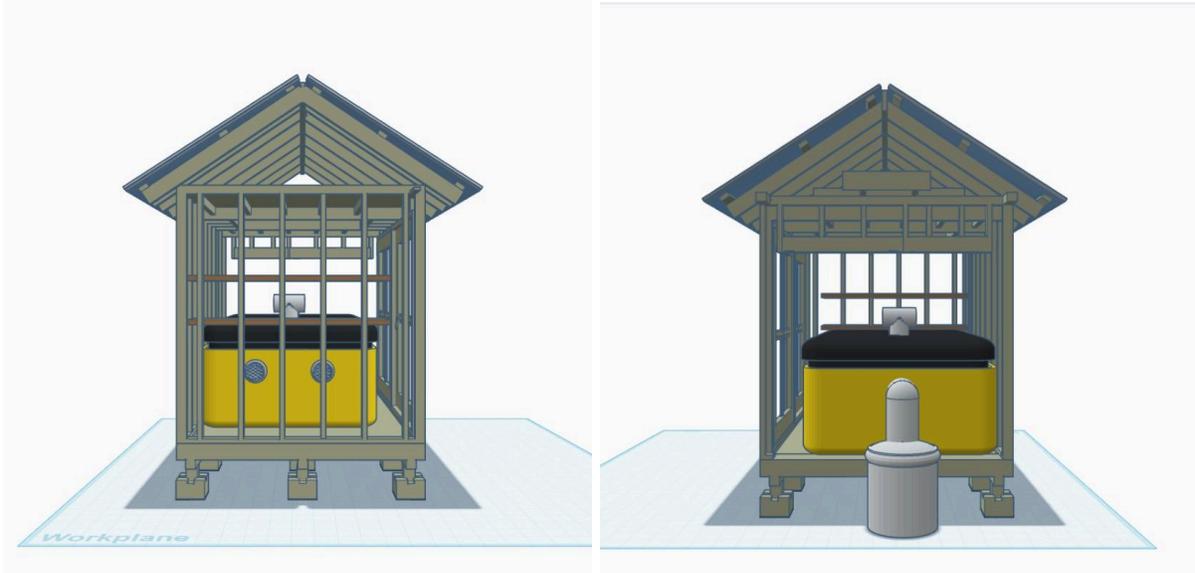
Side view of the Black Soldier Fly (BSF) composting and farming system.
